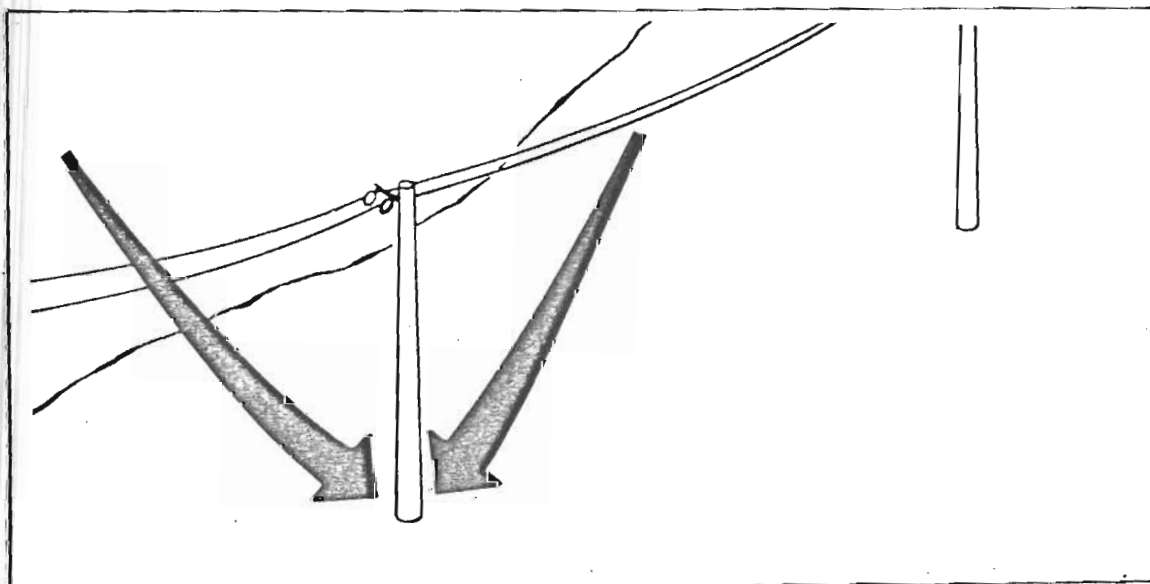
A steel vee here could not protect against both avalanches. Other protective measures must be used.
